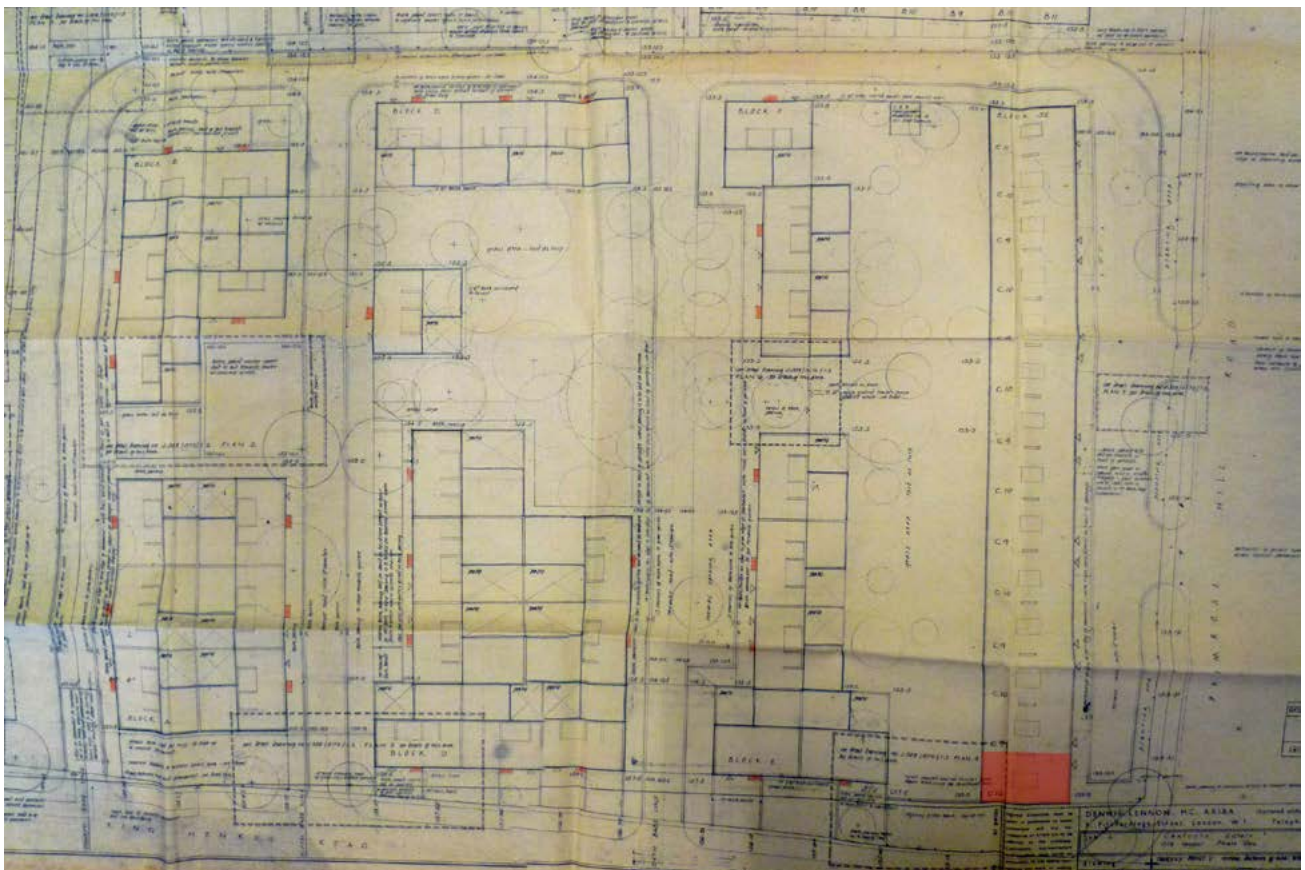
Site Plan, 1966 Dennis Lennon & Partners. London Metropolitan Archive
